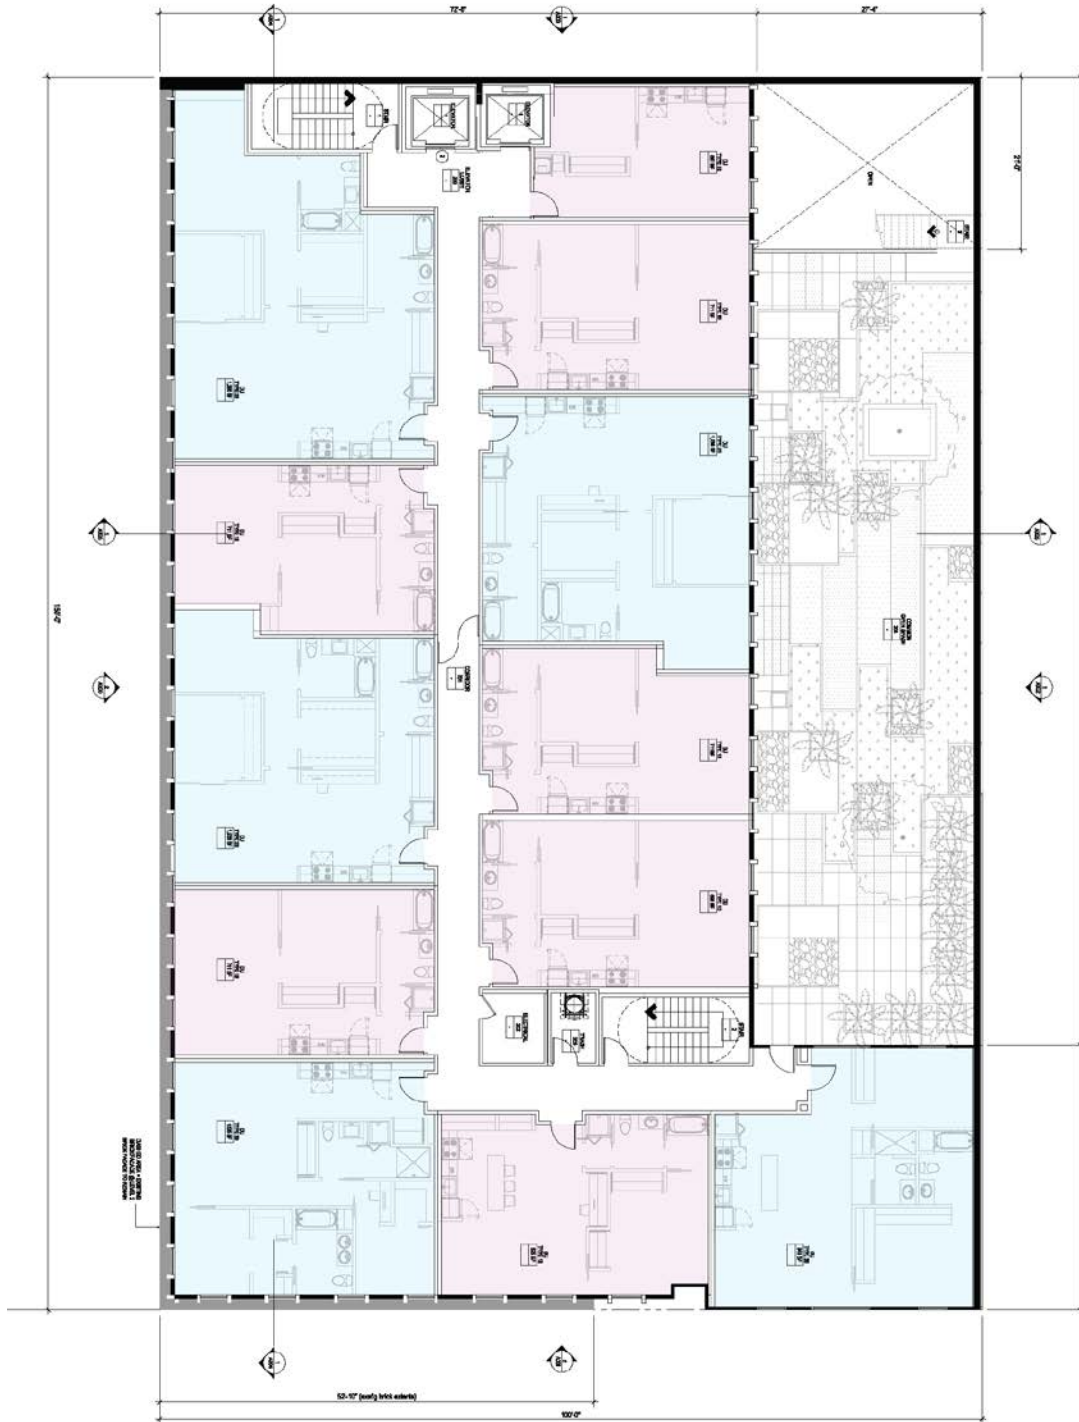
PROPOSED THIRD THROUGH SIXTH FLOORS
